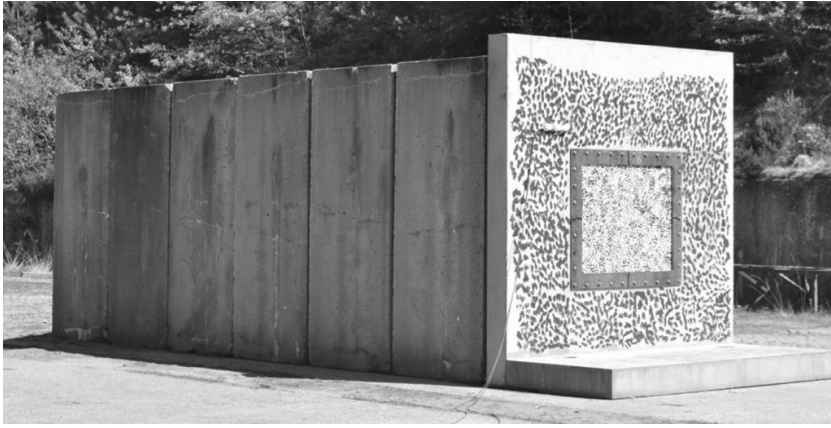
Shock tube and wall with glass panel installed, ready for testing.
